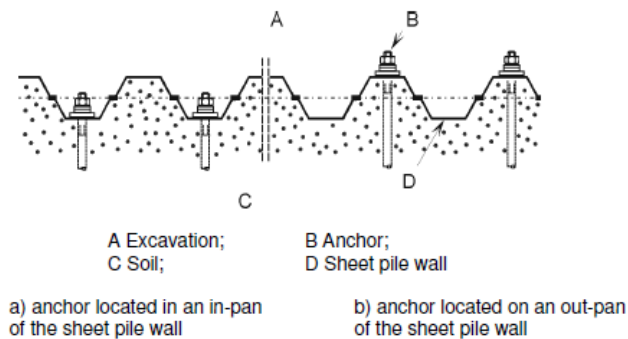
anchoring without waling (left: in-pan, right: out-pan) [11] (nen-en1993-1-5)
